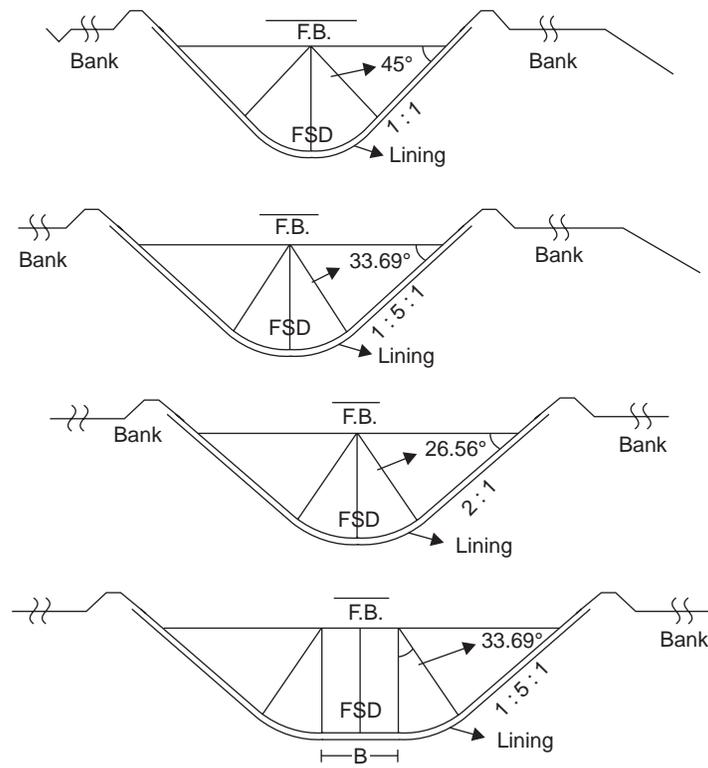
Semi Circular Canal Section (Mehboob Sections)
